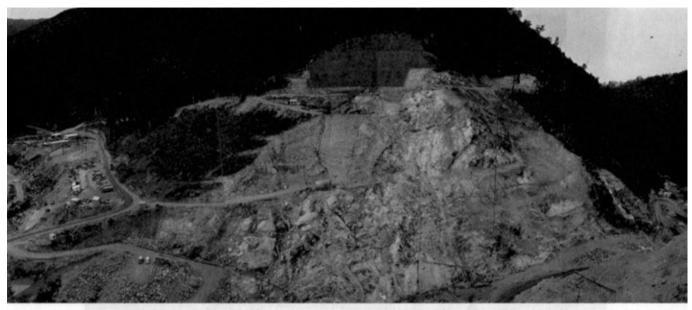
Geehi Dam, showing the excavation prior to placing the fill
